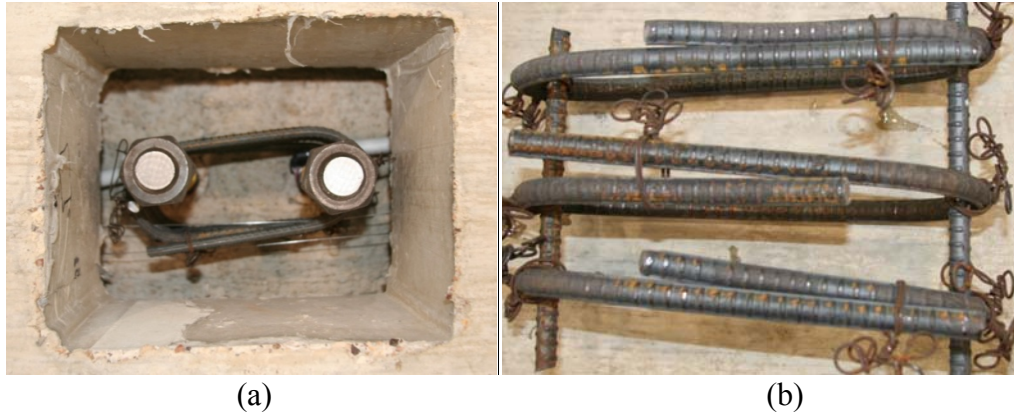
Photographs: (a) Setup for proper positioning of the hoops inside the shear pocket; (b) an inner confinement
